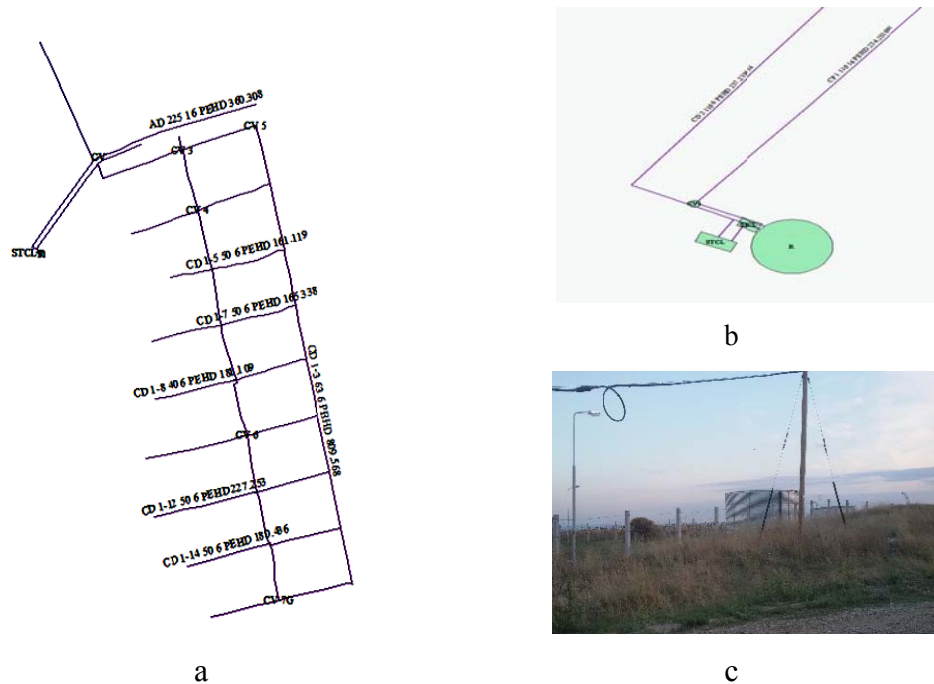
The map of hydraulic installation: a – The scheme of hydraulic installation in ArcMap b – details of hydraulic installation; c - Reservoir Avântu
